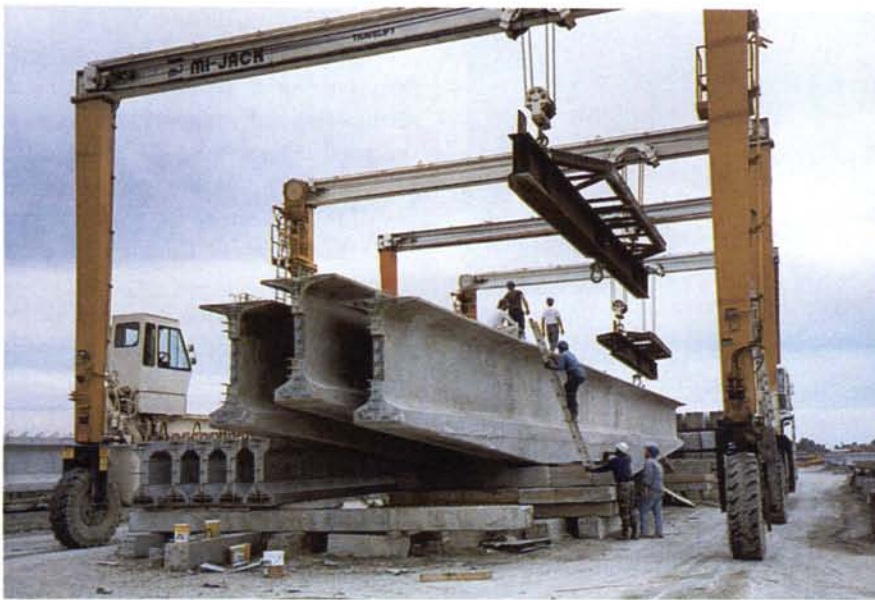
Special lifting equipment was used to handle the heavy haunched girder sections.
